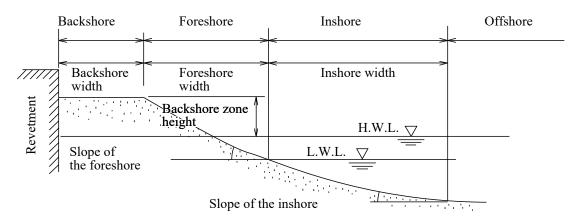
Example of the Cross Section of a Typical Beach
